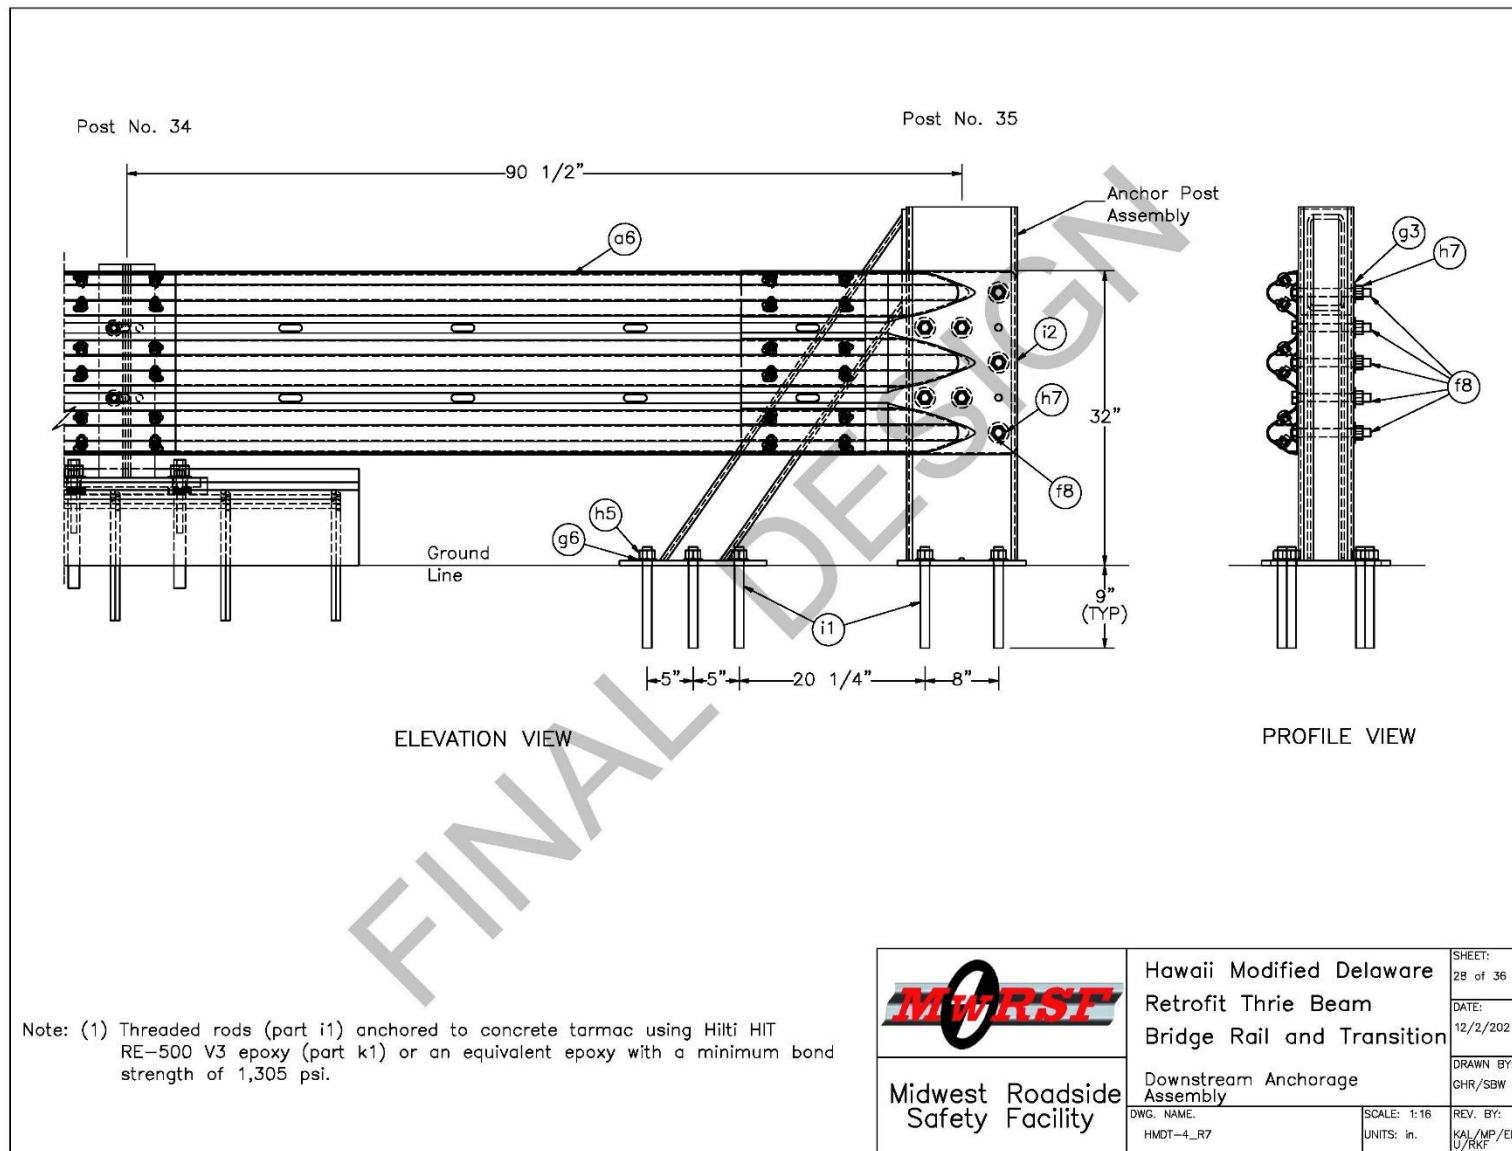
Downstream Anchorage Assembly, Test No. HMDT-4
